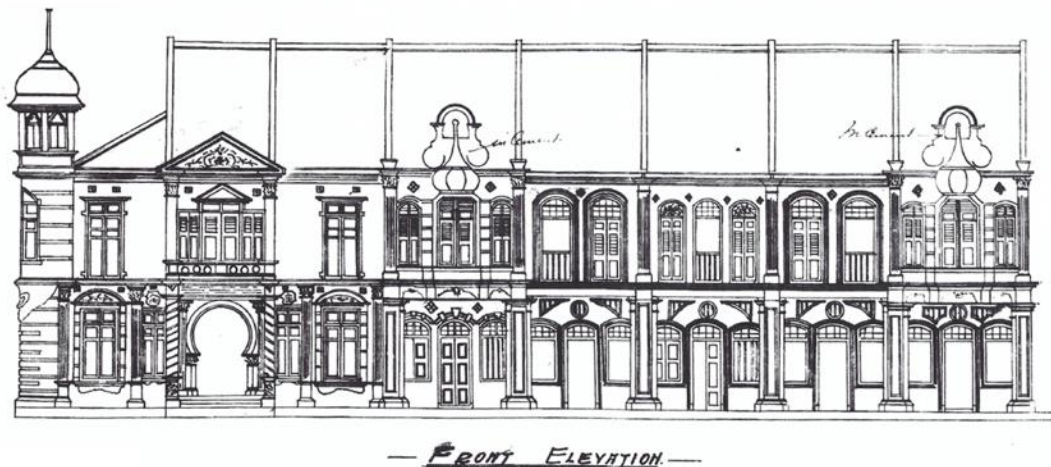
R.T. Rajoo. *Six houses for Thayammal*, 1915. NAS CBS 1113, Building Plan 2239.
